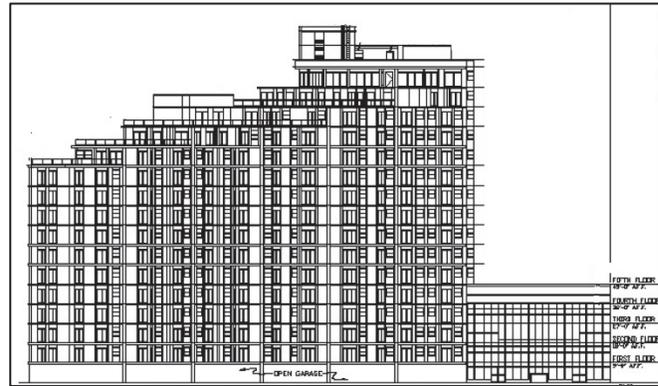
Sketch of Southern (Oceanfront) Building Elevation
